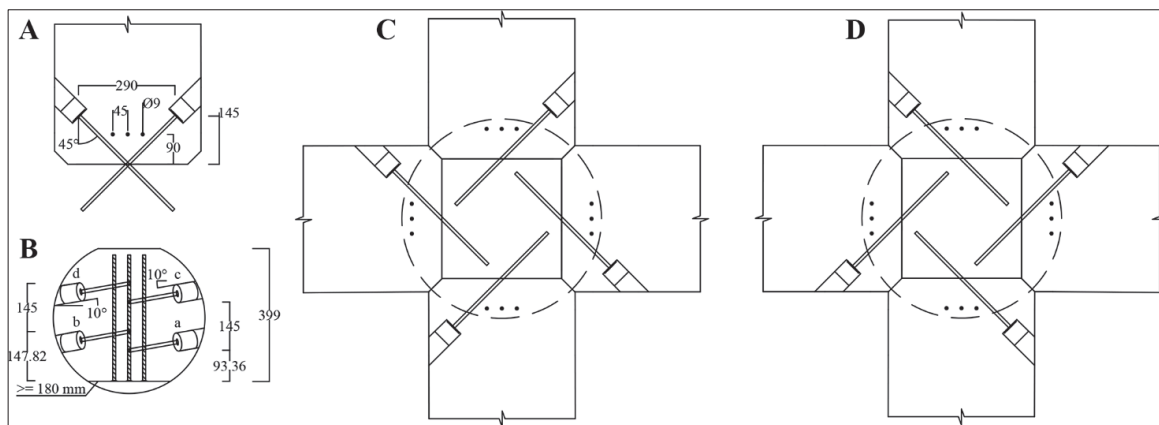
Idealised detailing of the anchored seated-tenon. (A) Internal plan view and (B) internal front view of steel detailing, including 9Φ mm compressive reinforcement and 11Φ mm tensile reinforcement. Also seen in (B), angled isolating anchor pockets and predrilling for reduced fire exposure and clash risks. Column section and plan view of steel layer patterns of screws a and c seen in (C), and screws b and d seen in (D).
